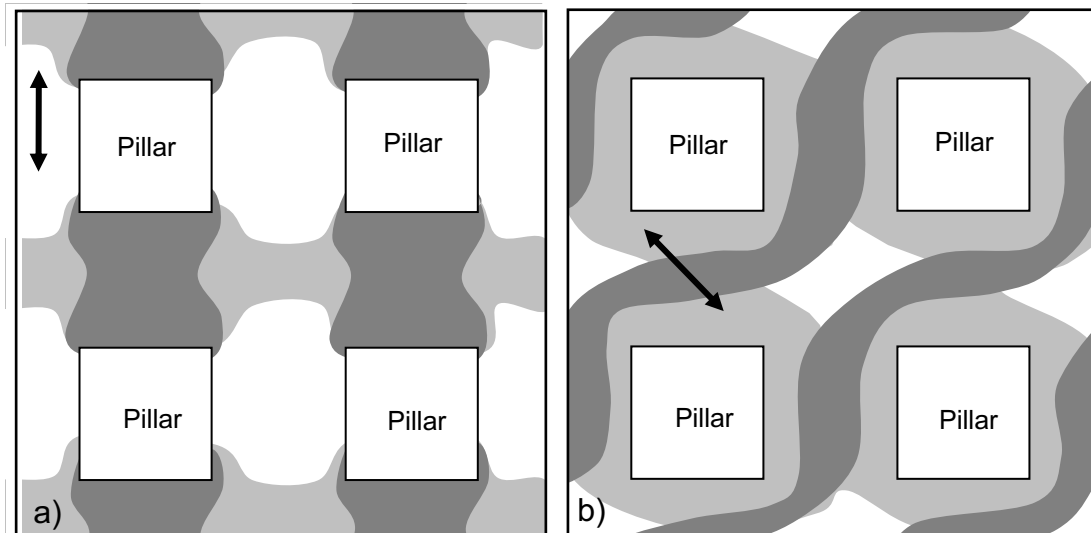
Plan view showing effect of a change in the orientation of the maximum horizontal stress potential roof failure in a room and pillar layout consisting of square pillars. Darker shading indicates initial failure and lighter shading indicates potential failure growth. The arrow indicates the direction of maximum horizontal stress.
